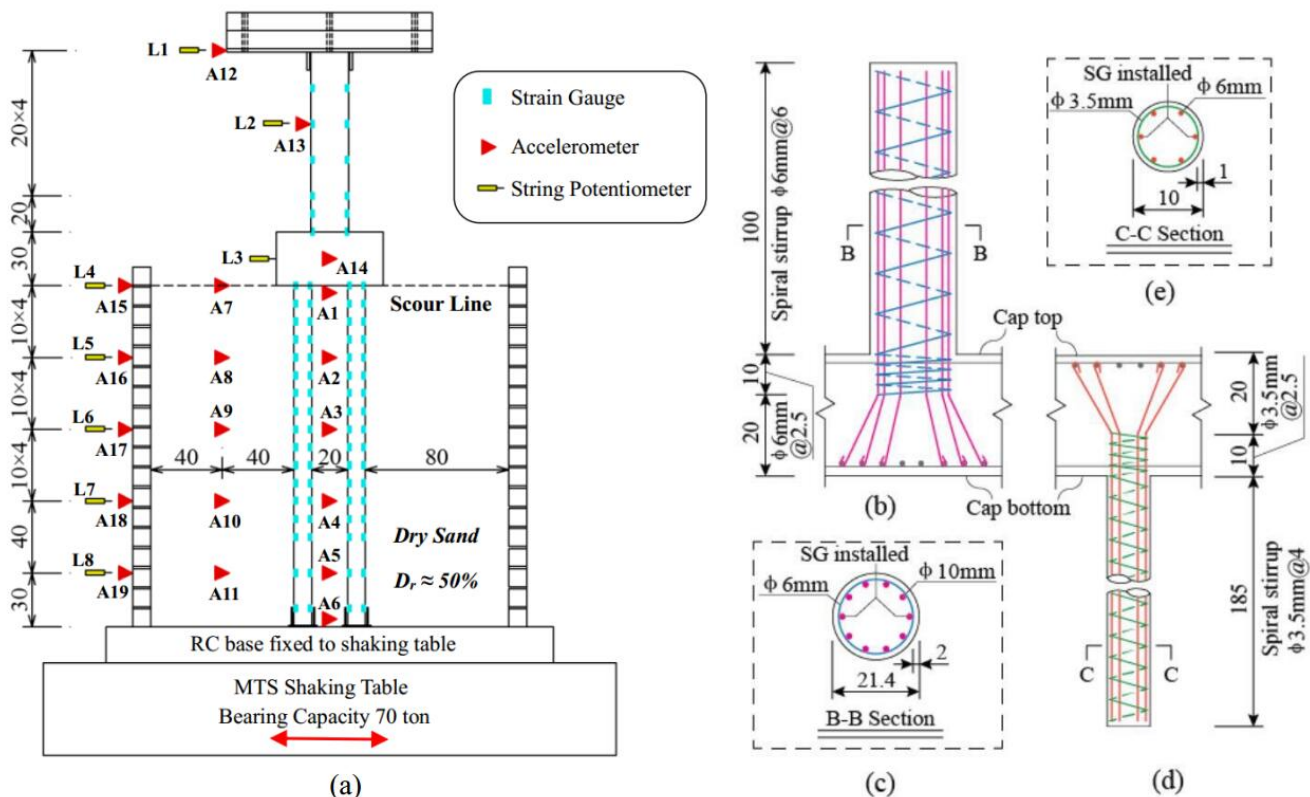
Bridge specimen in saturated or dry medium dense sand for shaking table tests: (a) global schematic diagram, (b) pier reinforcement, (c) pier section, (d) pile reinforcement and (e) pile section (Note: unit is centimeter except for specific annotations)
